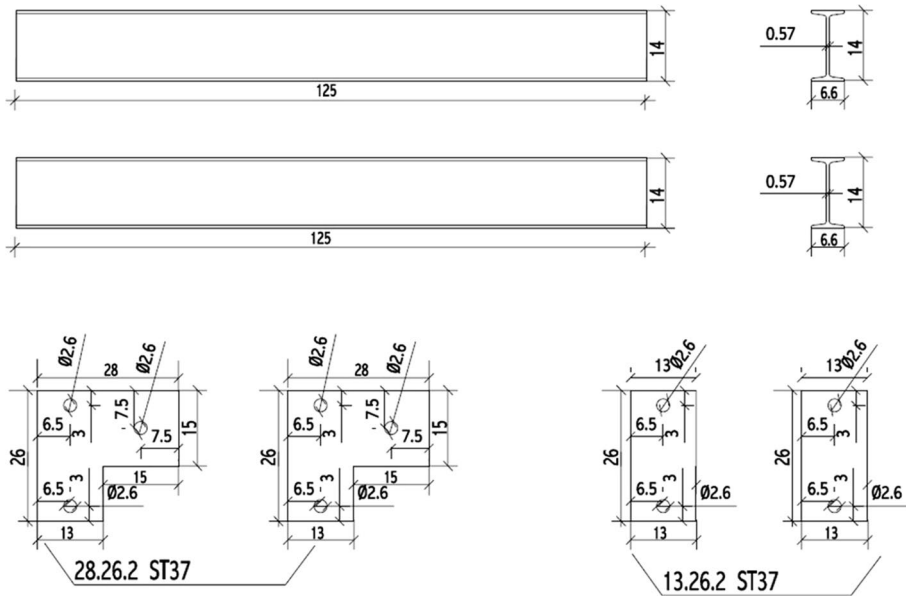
Details of steel tie beams connecting to the frame and external shear wall (in mm) (Kucukgoncu 2018)
